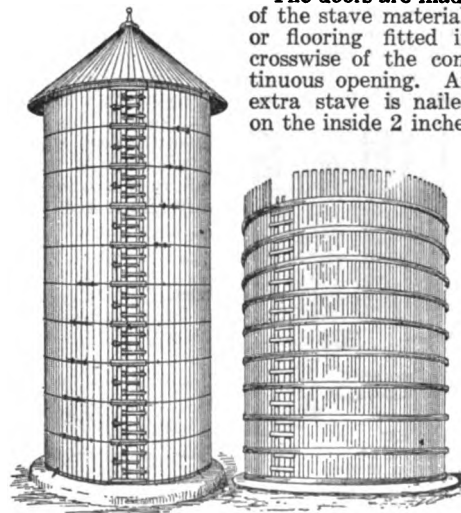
Stave silos. One with roof and iron hoops completed, the other with wooden hoops, unfinished
